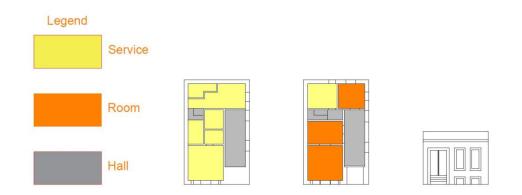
The base sample of the single-story İzmir Houses in with plan type 4
